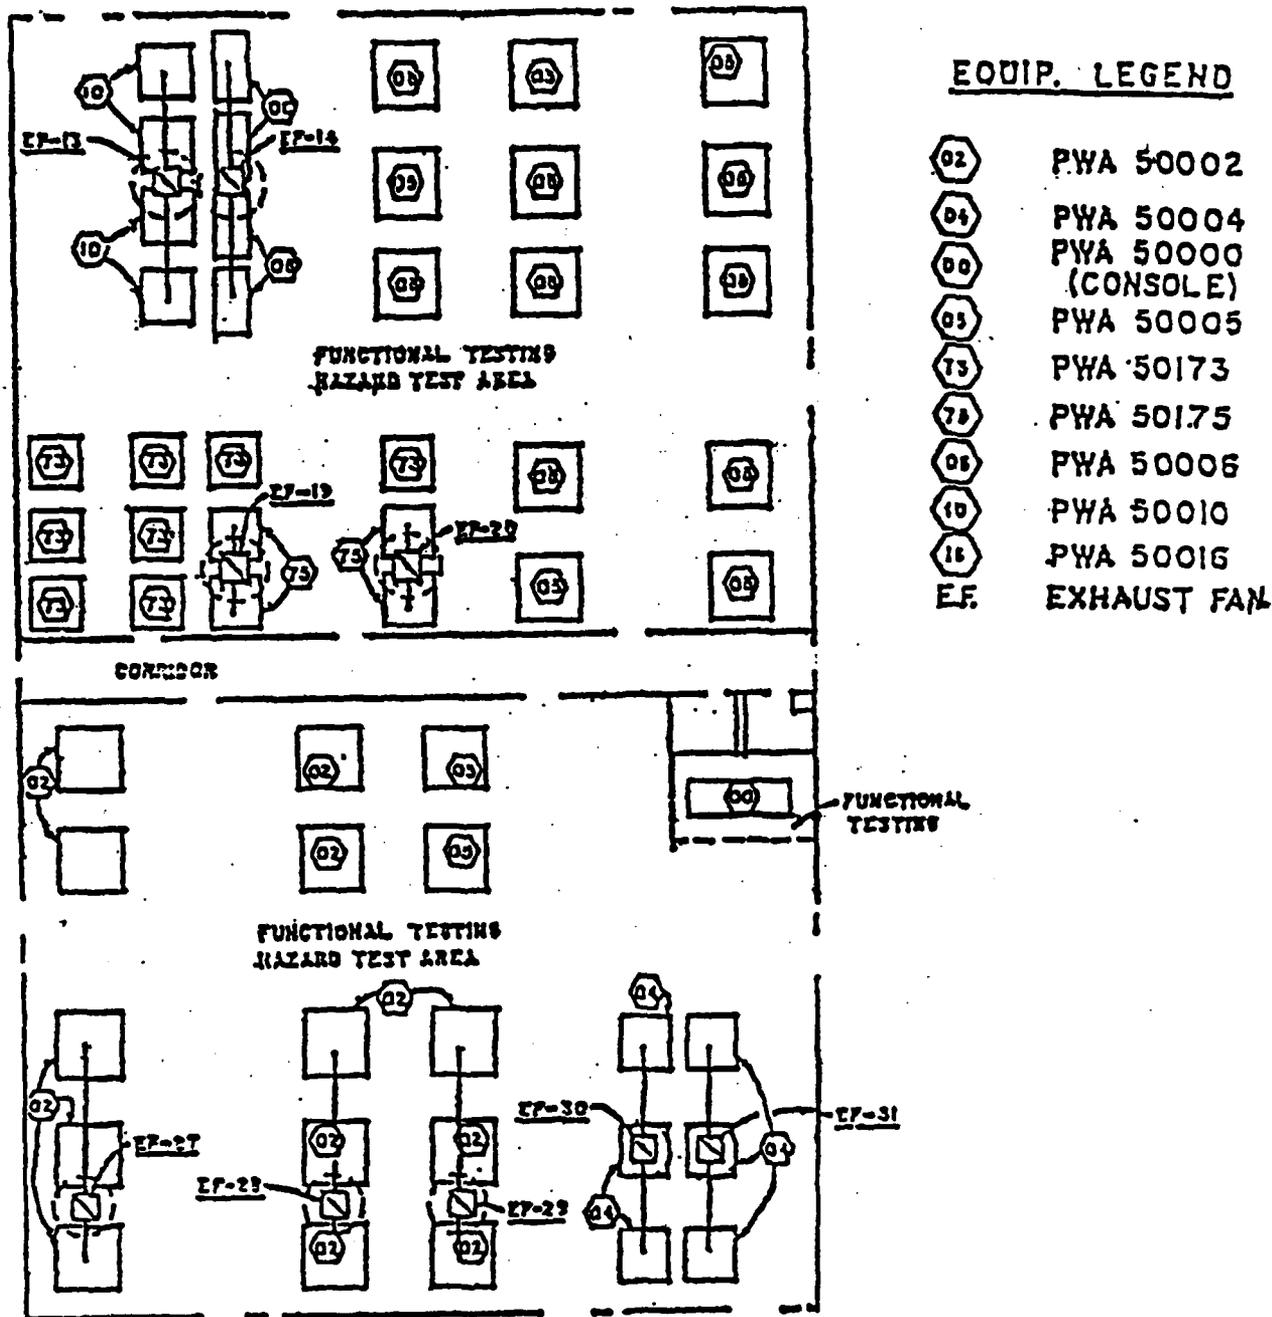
Building 348 Ground Floor Plan - Location of Process Stations
